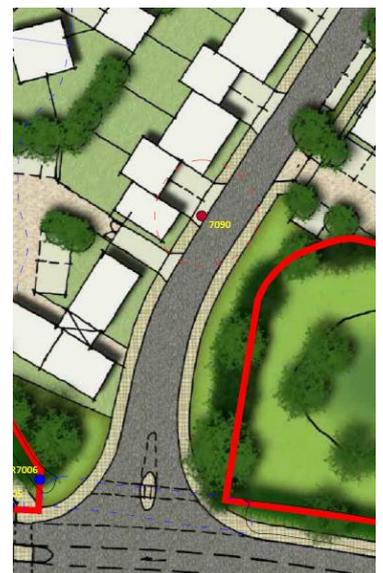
Extract from Tree Survey showing tree 7090 on illustrative layout
